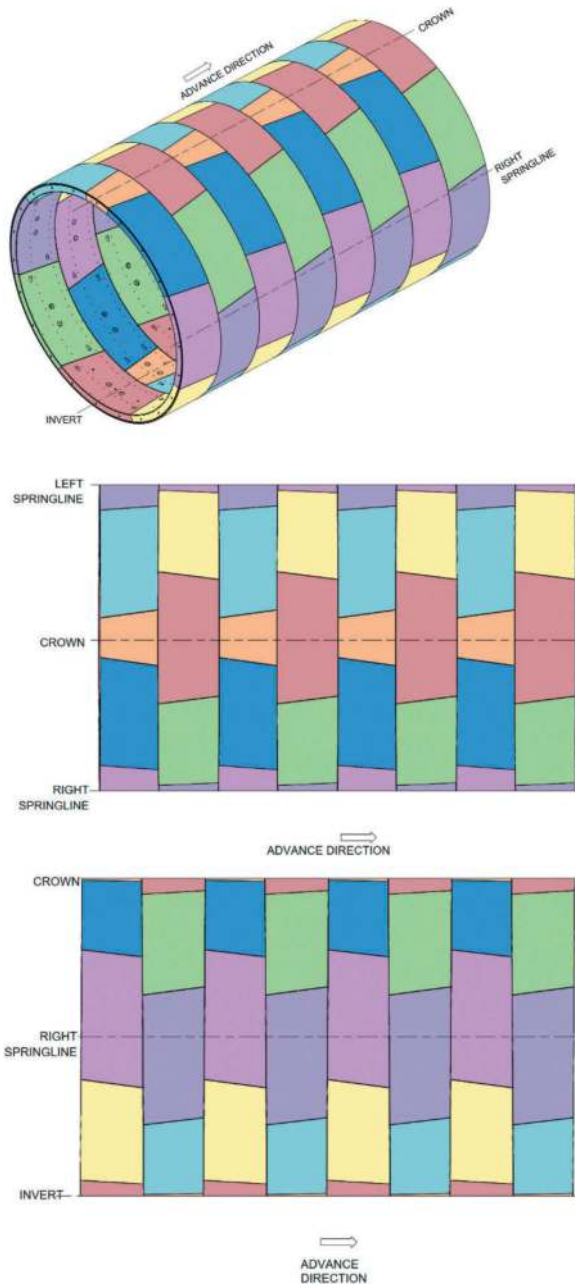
Negotiation of tunnel alignment by rotation of key segment in a tangent drive (from top to bottom, isometric view, plan view, elevation view).
